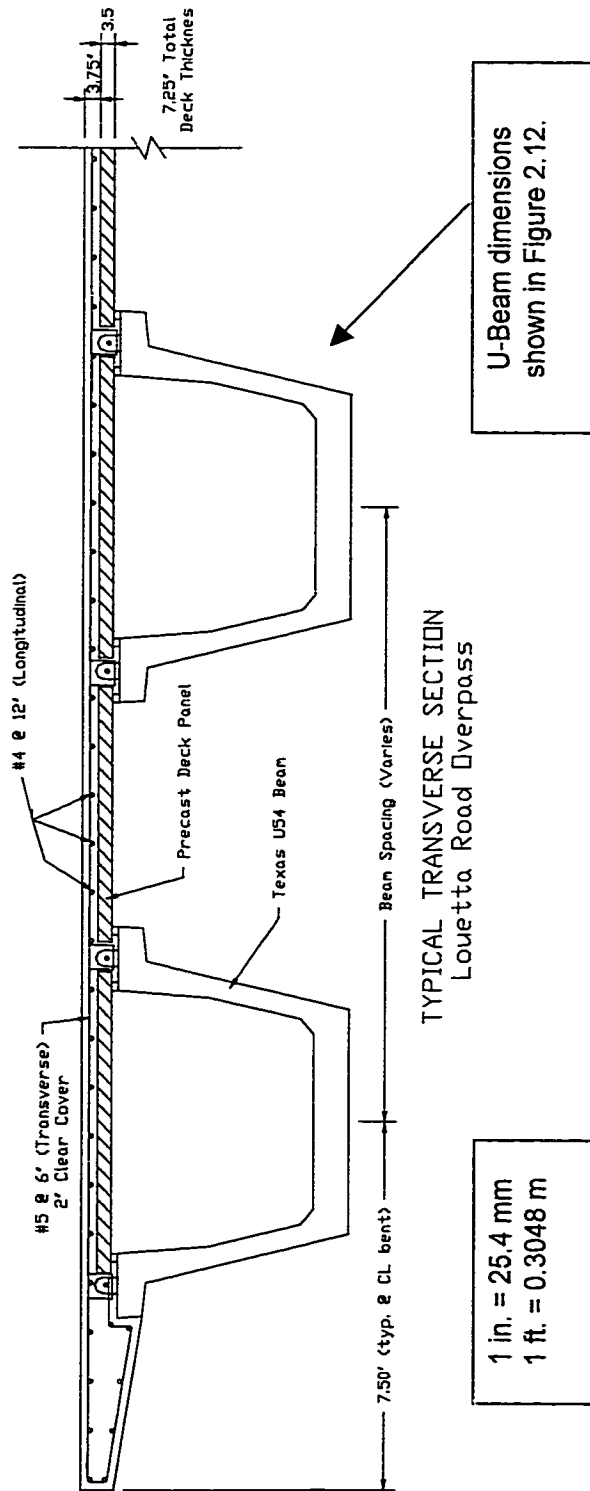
Partial Roadway Cross-Section (Louetta Road Overpass)
